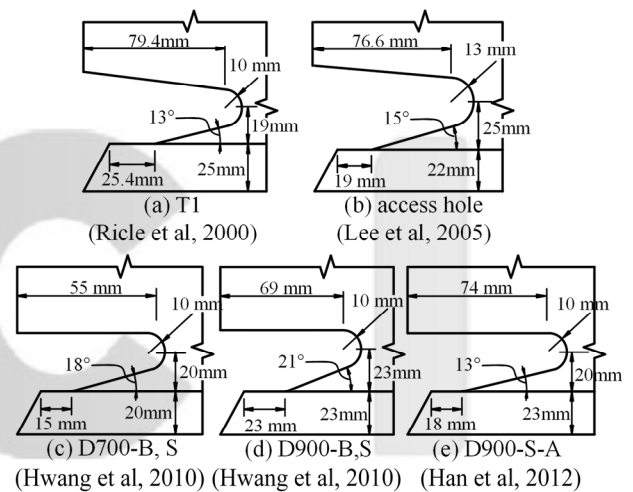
Access hole geometries and sizes of WUF-W connection specimens
